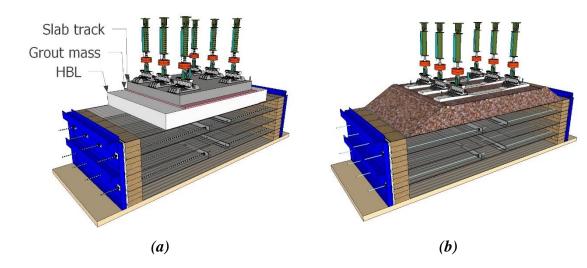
Layout of the ballast and slab tracks on GRS-RW embankment (a) concrete slab-track; (b)
